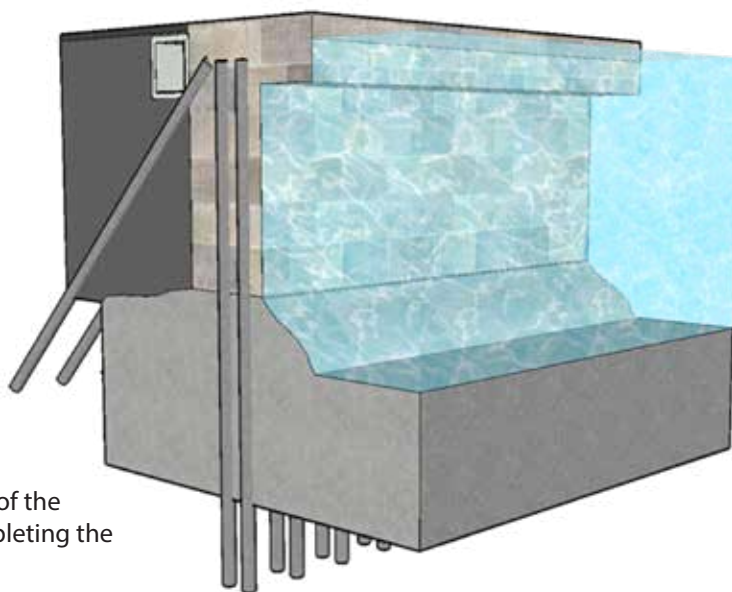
3D reconstruction of the entrance dock after completing the works.
